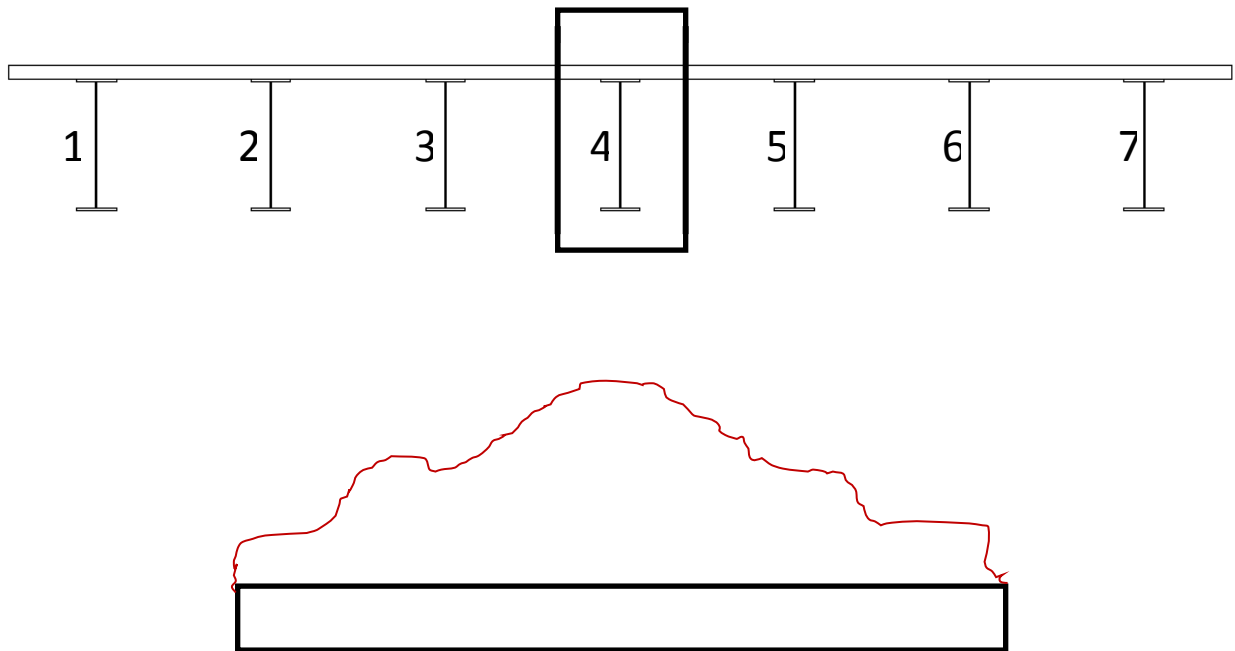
Cross section of the simulated highway bridge showing the layout of steel girder 4.
